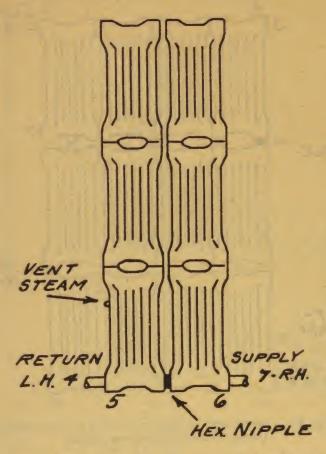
Assembled in two or more stacks. One and two pipe steam only. Bottom feed only.
